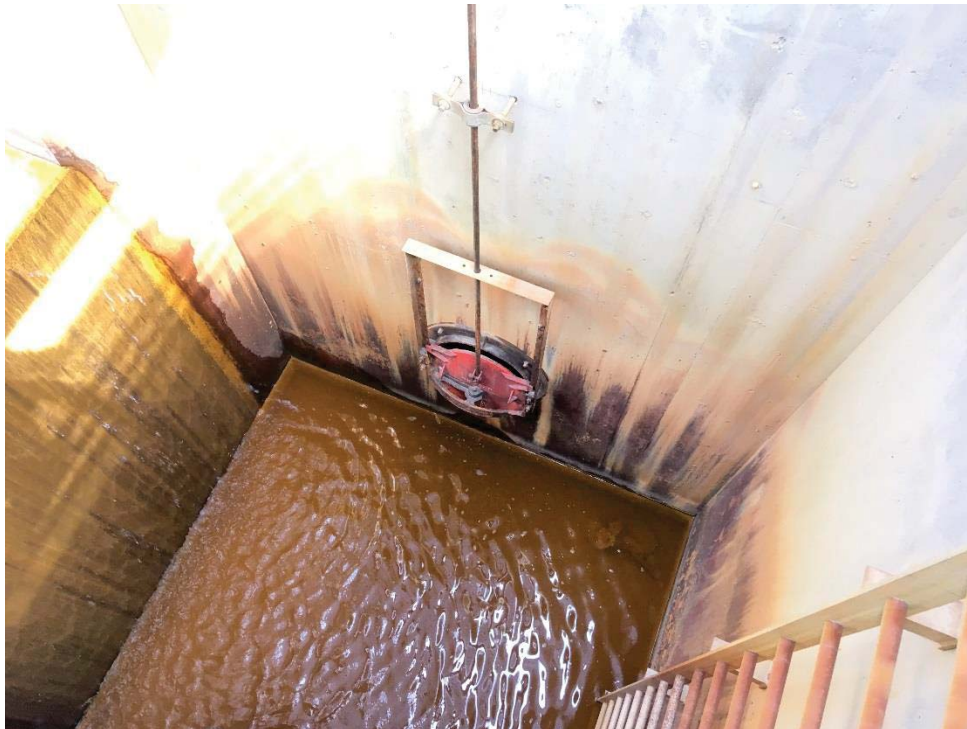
Patch over the Surge Pond low level outlet appears to be holding water with minimal leakage. The plate is likely blinded off by sediment.
